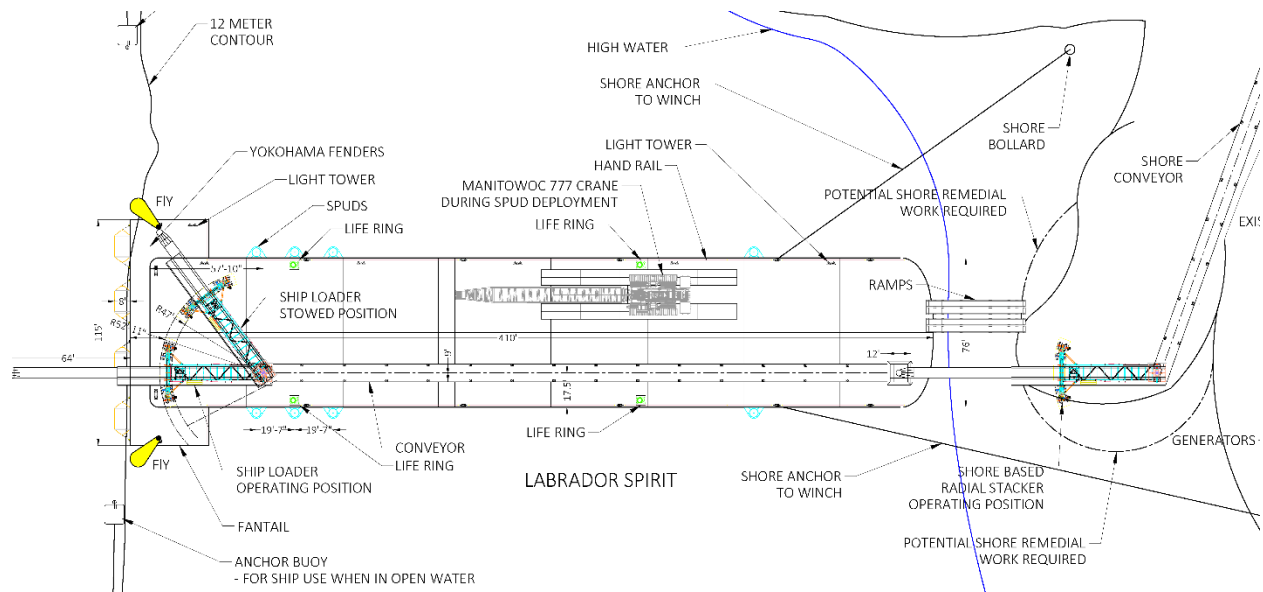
Layout of proposed Labrador Spirit barge facility
